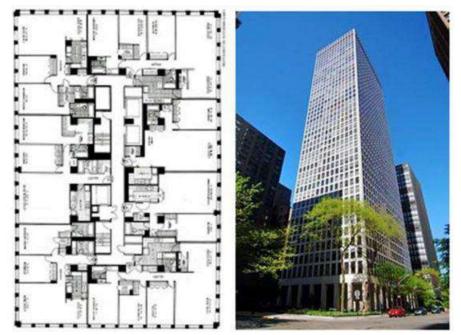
De Witt Chestnut Apartment Building in Chicago [4,5]
